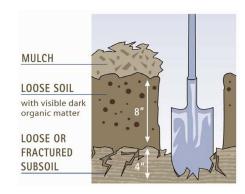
Planting Bed Cross-Section (NTS)
